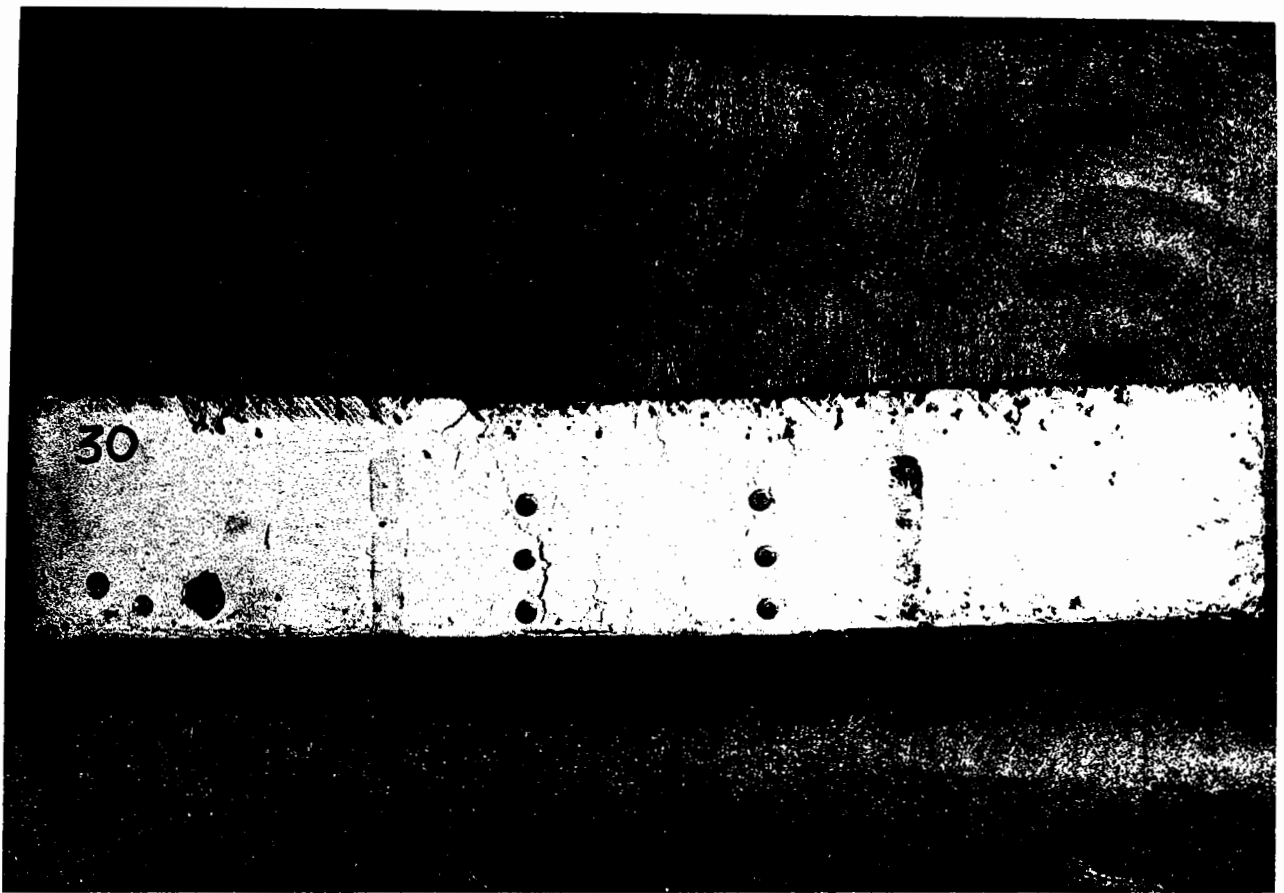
(a) Beam Test 30 ; 75mm Geotextile Interlayer
